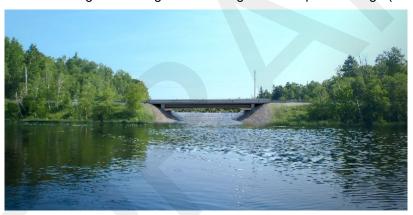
Digital Rendering of the Proposed Bridge (South View)
